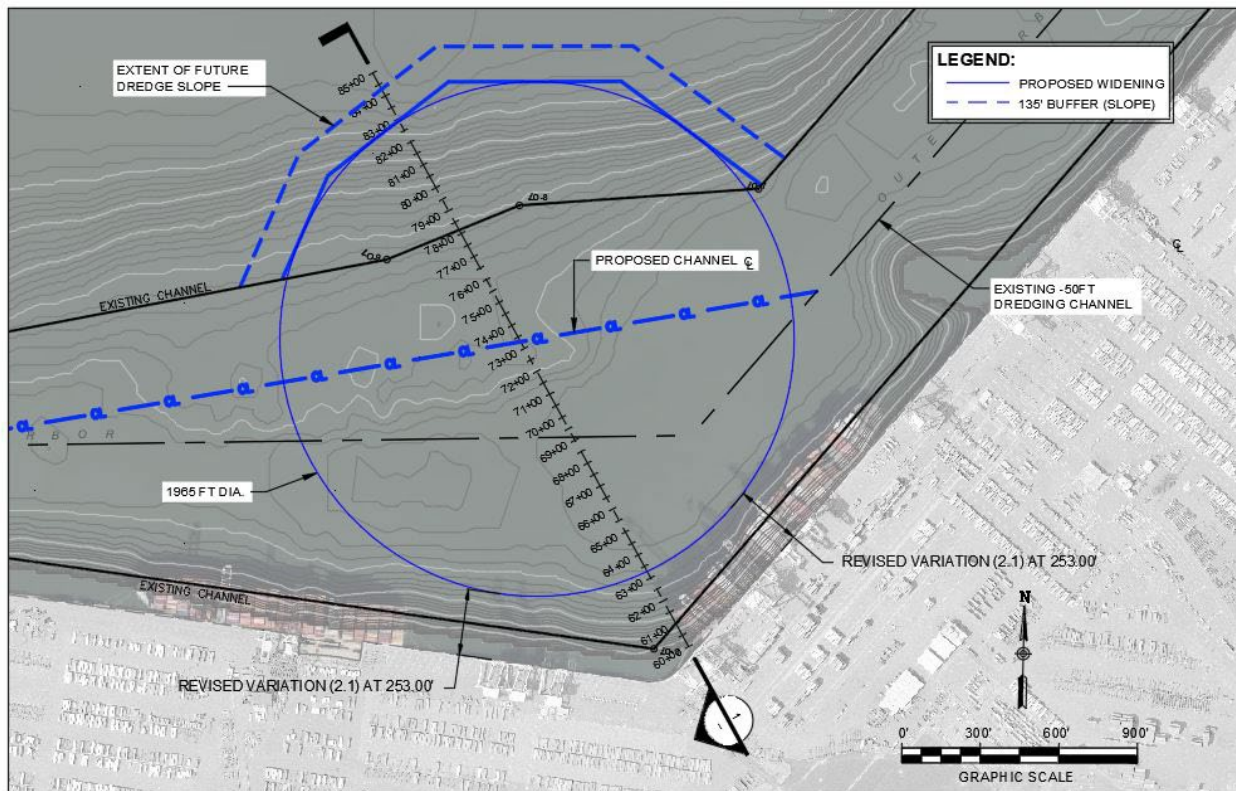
Outer Harbor Plan View for Cross Sections, Stationing
